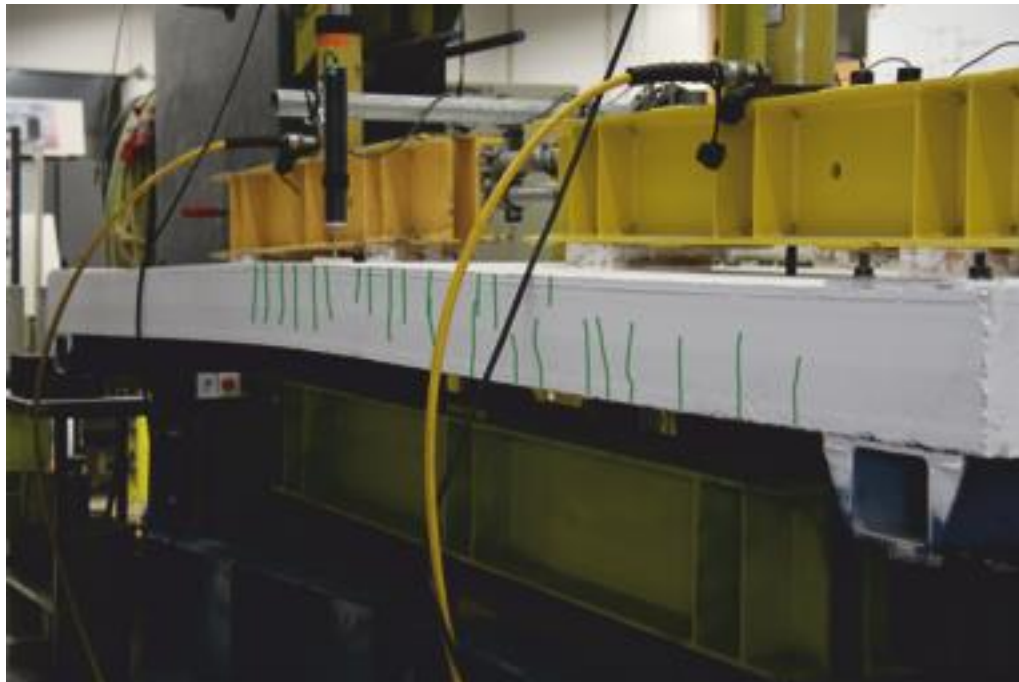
Bending cracks at the bottom side of the C-50 BR specimen.
